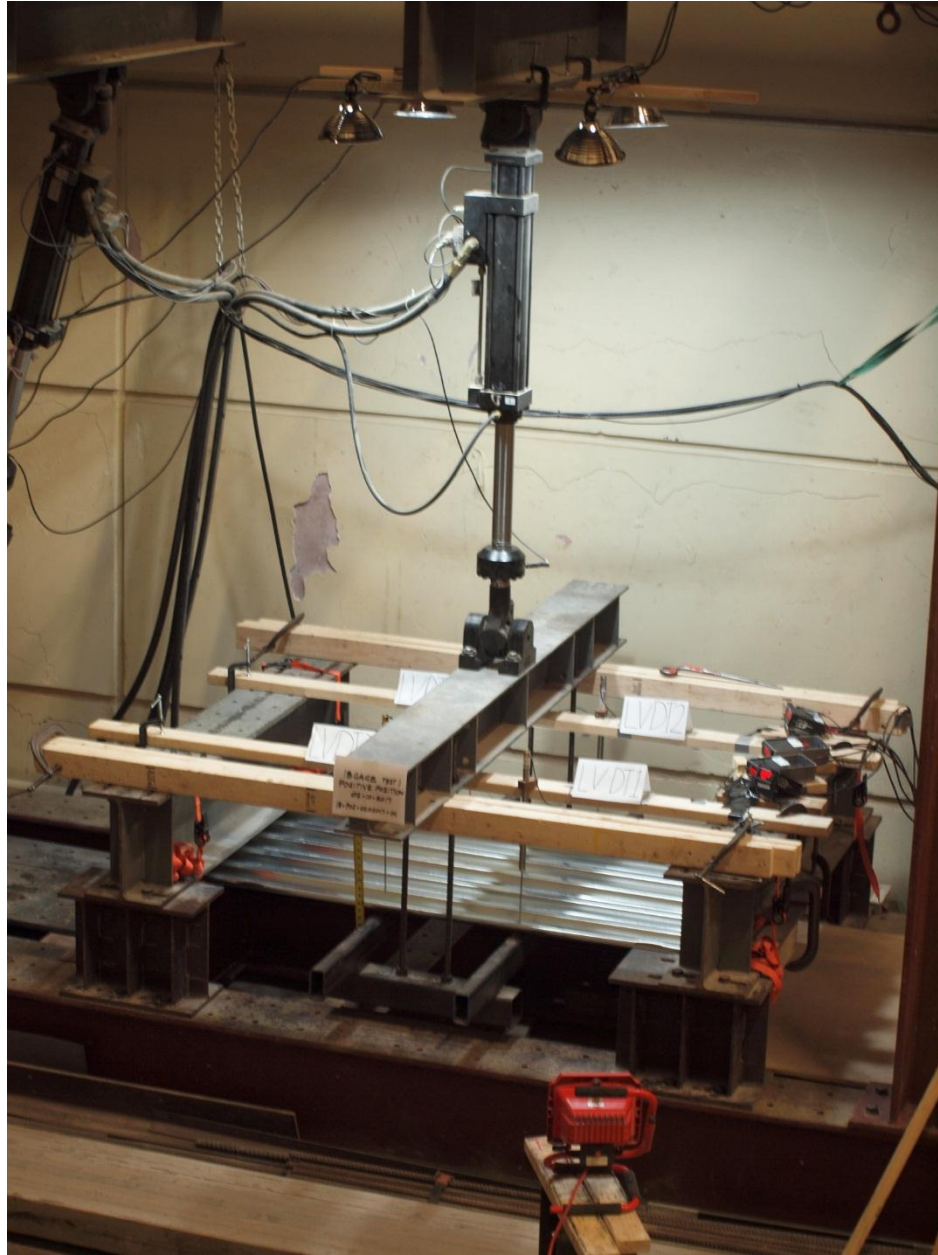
18 Gage Deck Positive Bending - Initial Setup.
